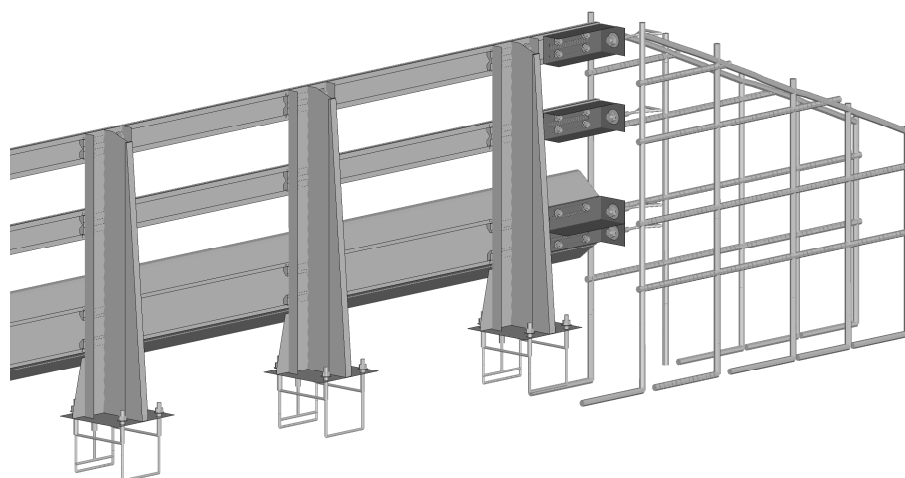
Beam elements for the reinforcing bars embedded in a concrete terminal of the TMBR.
